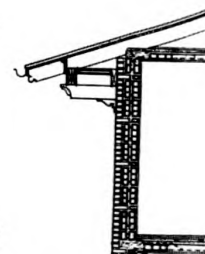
A roof similar to that shown in Fig. 52, but with slightly different finish of eaves. The wall is hollow tile and brick veneer.
